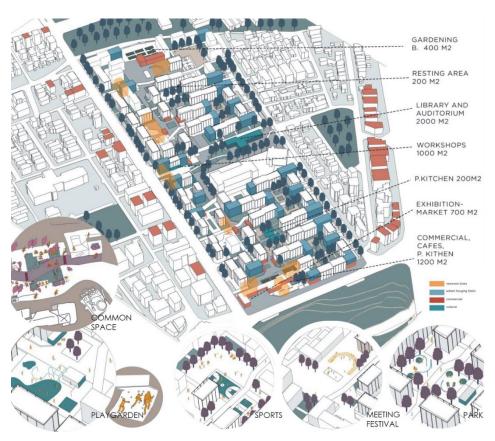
Drawing showing the proposed public facilities and retail. Ayça Özgün.
